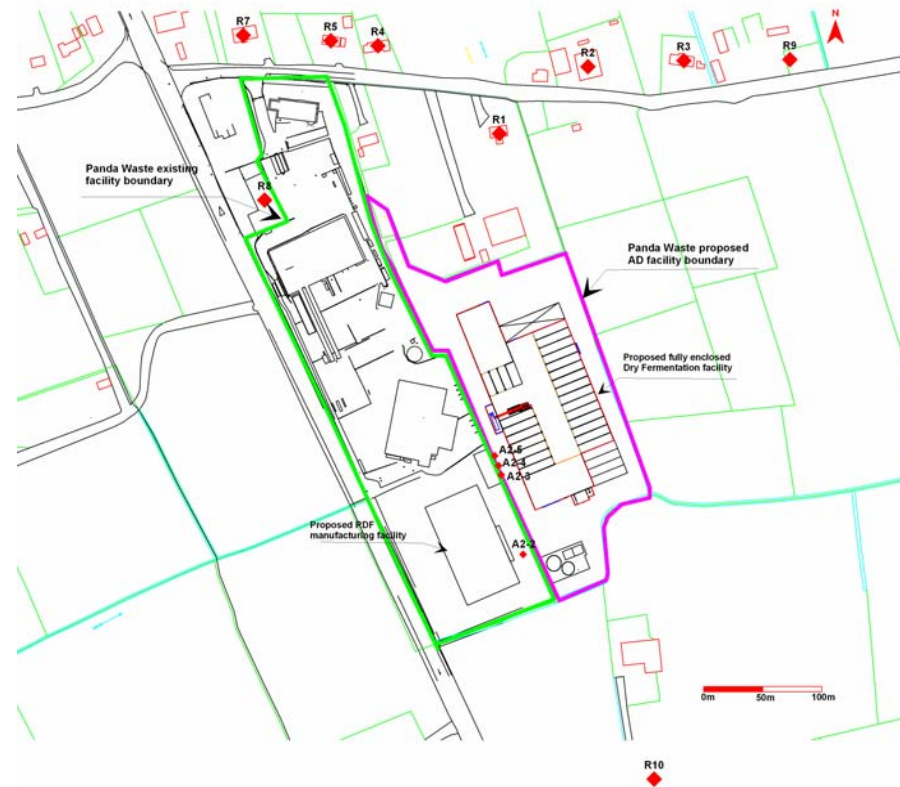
Plan view facility layout drawings for Panda Waste Ltd facility including specific location of proposed emission points A2-2 to A2-5 and nearest sensitive receptors R1 to R10.
